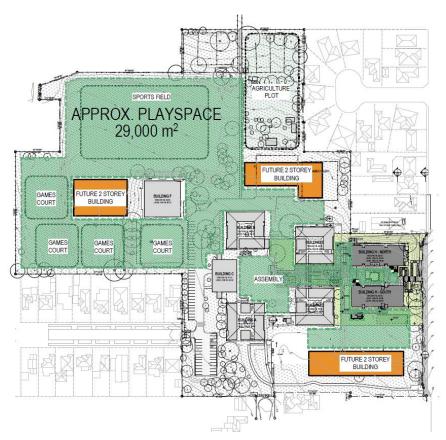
Play space on site under a potential future scenario Source: Fulton Trotter Architects
